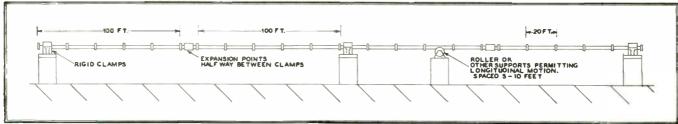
PROPOSED CONSTRUCTION FOR A LONG LINE COMBINES RIGID AND ROLLER MOUNTS, AND EXPANSION JOINTS
